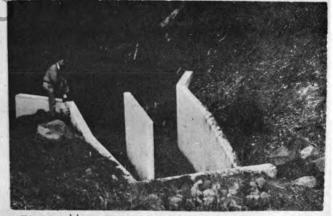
Concrete debris fin for single culvert. Preferable if more area existed between wingwalls and fin.
